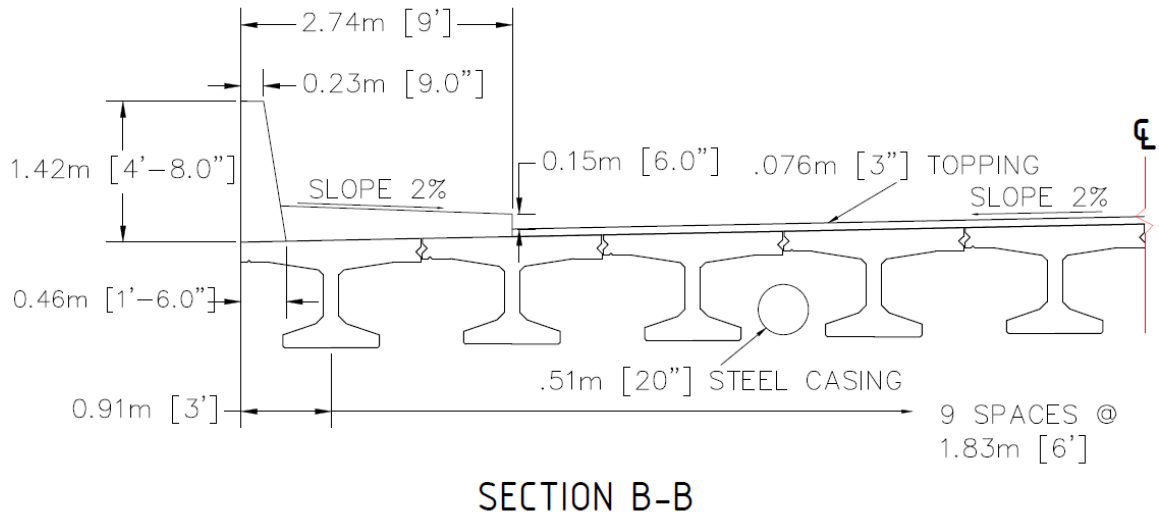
Half of Bridge Cross Section, Section BB from Figure 2.4
